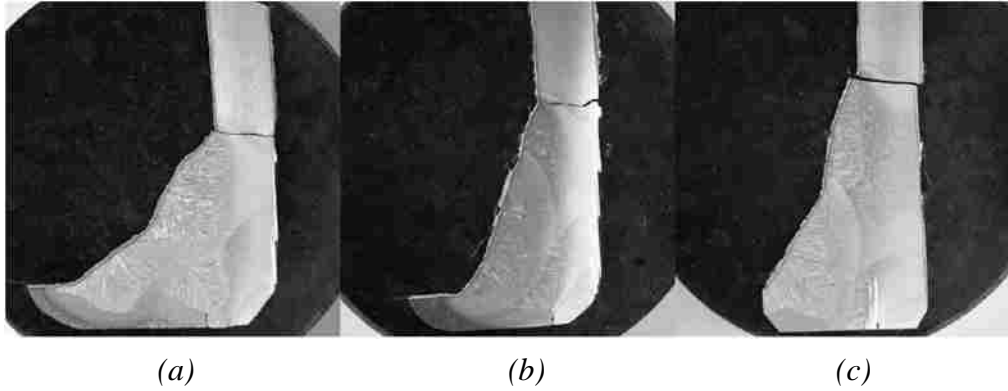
Type I specimen mast arm weld profiles: *a*, Specimen I-1; *b*, Specimen I-2; *c*, Specimen I-3.
